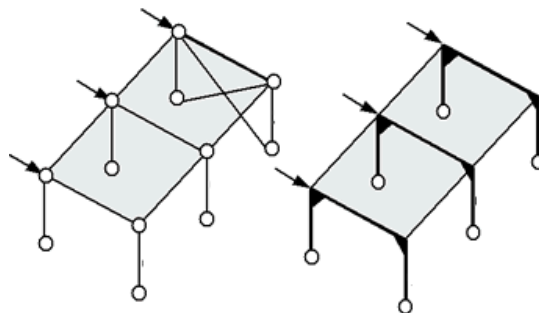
Non-sway structure (left) and sway structure (right) (Den Hollander, n.d.)
